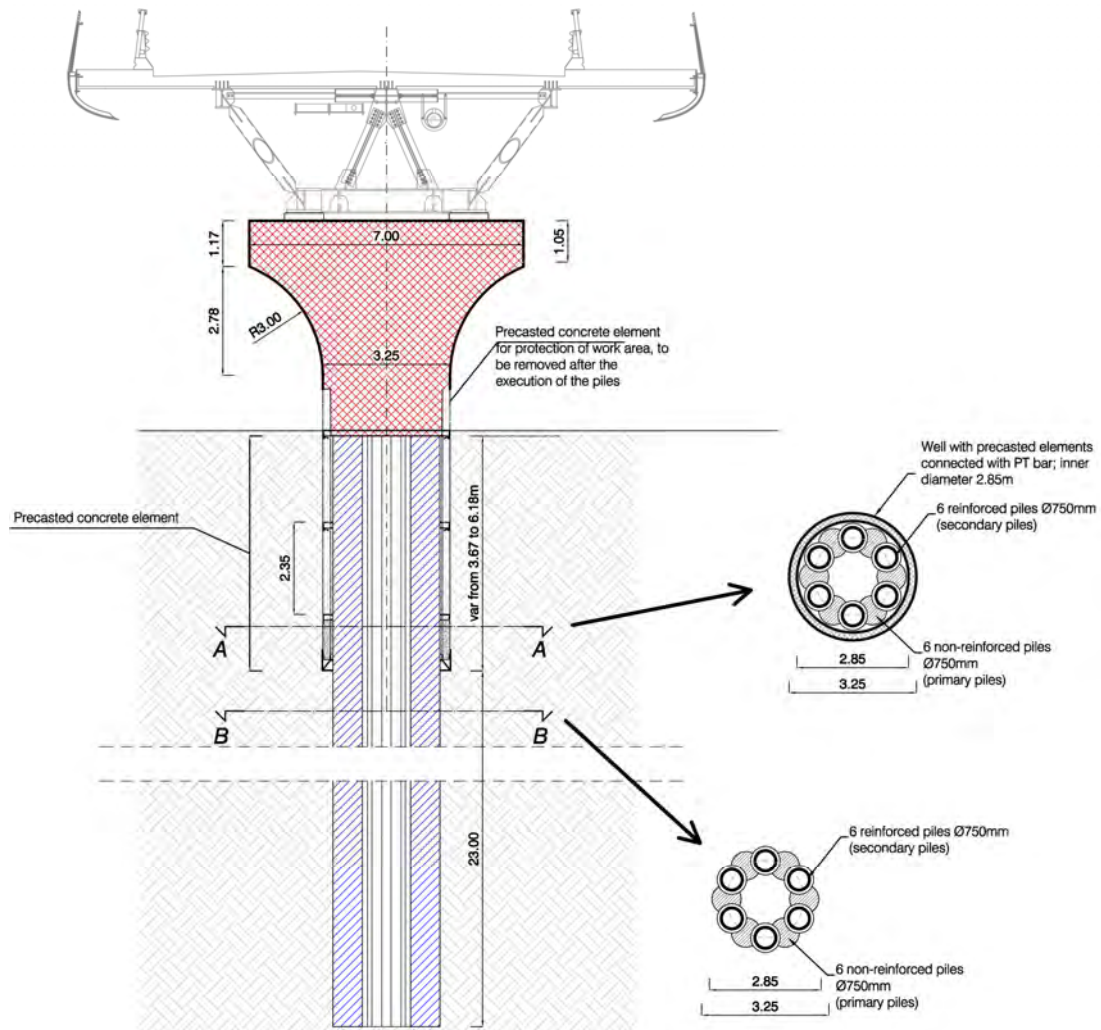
Vertical section of the whole structure with highlighted annular monoblock foundation and the well with self-founder precast caissons. Above, the foundation section with linings and, below, the same made only by piles
